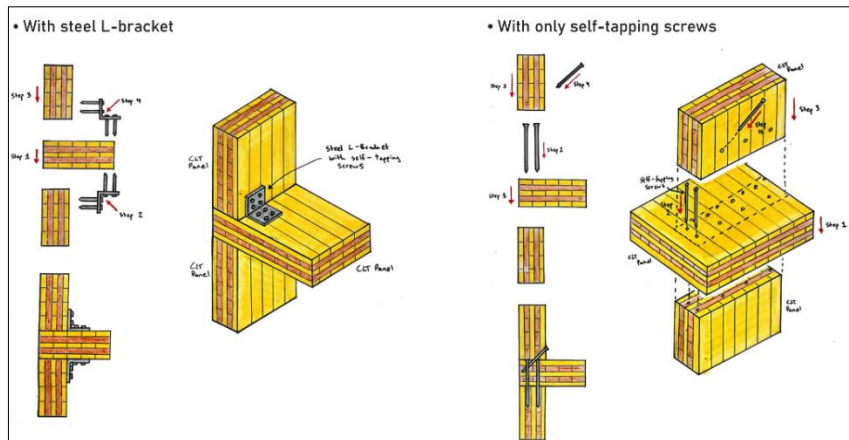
Showcase of Two DfD Methods of CLT Wall-to-Floor Connection
